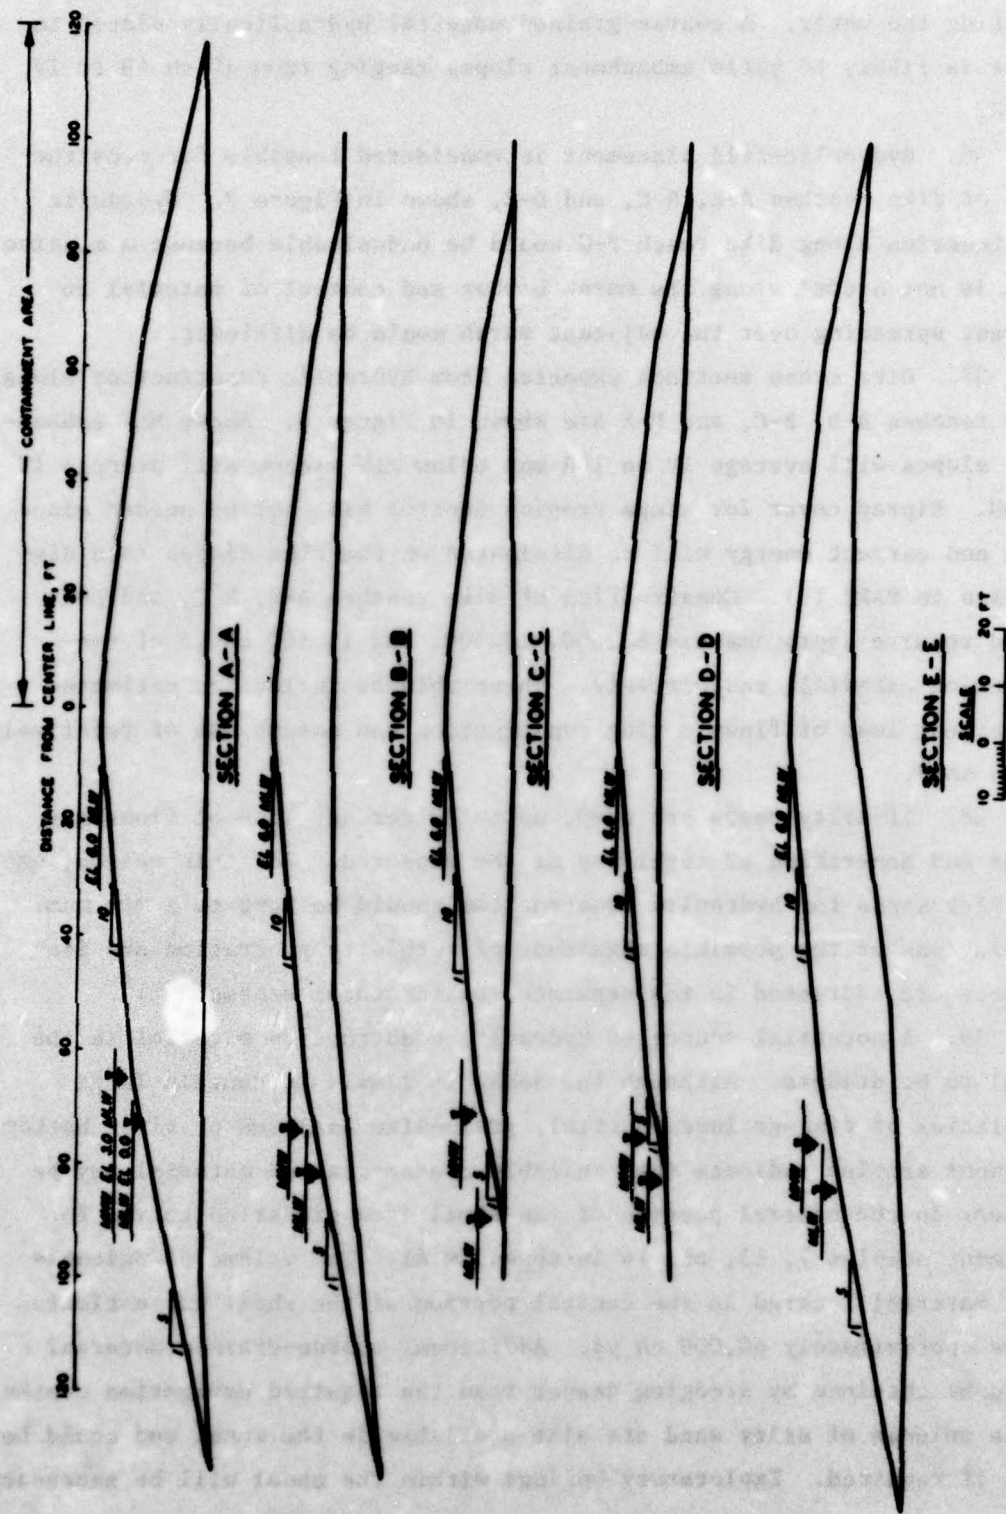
Hydraulic-fill cross sections (Section locations are shown in Figure 7)
